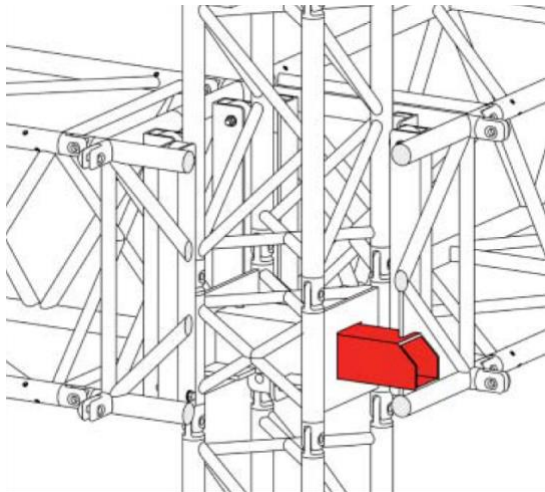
Example of securing a load suspended from a tower by means of a locking bar
